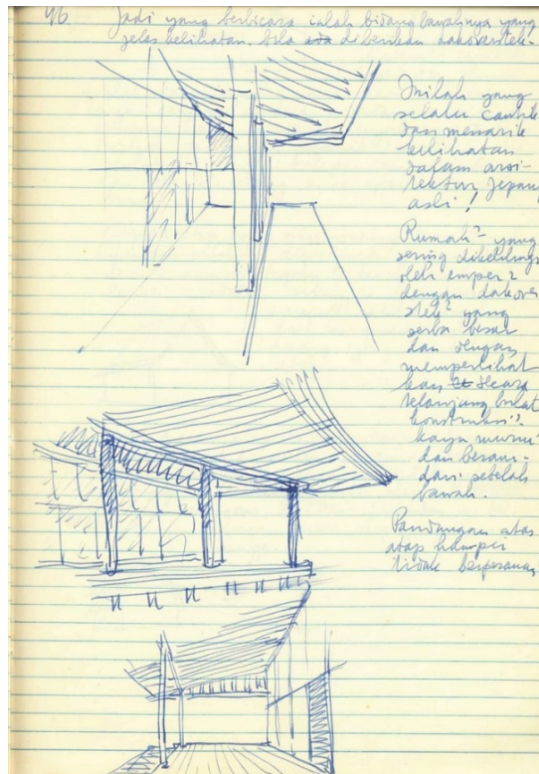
Silaban's sketches of Japanese verandas¹⁴⁾
